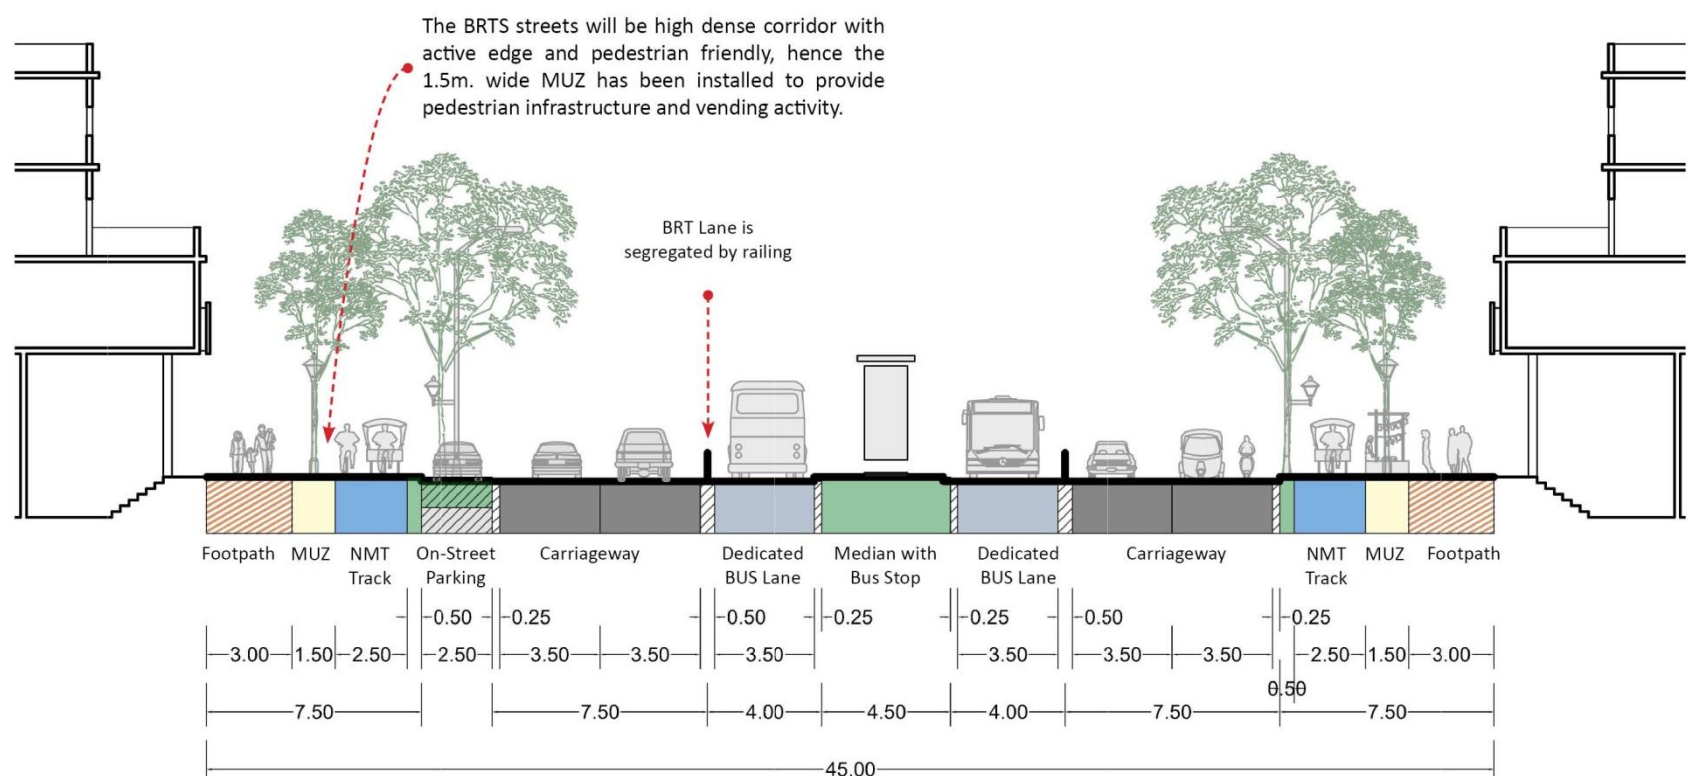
Sub arterial typical road section with BRTS, 45m ROW
